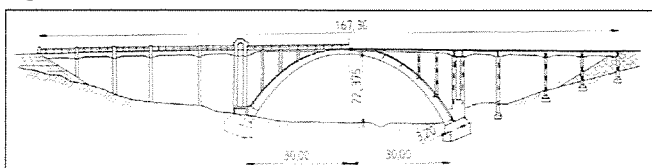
The first reinforced concrete bridge at narrow gauge railway, 1905
